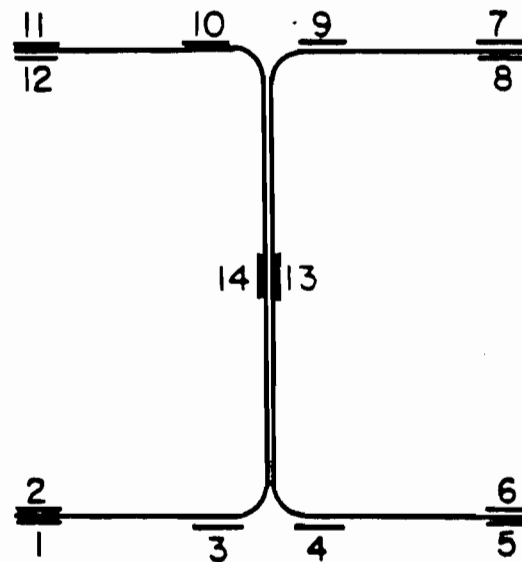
Locations of Strain Gages at Midheight of I-Shaped Stub Columns
